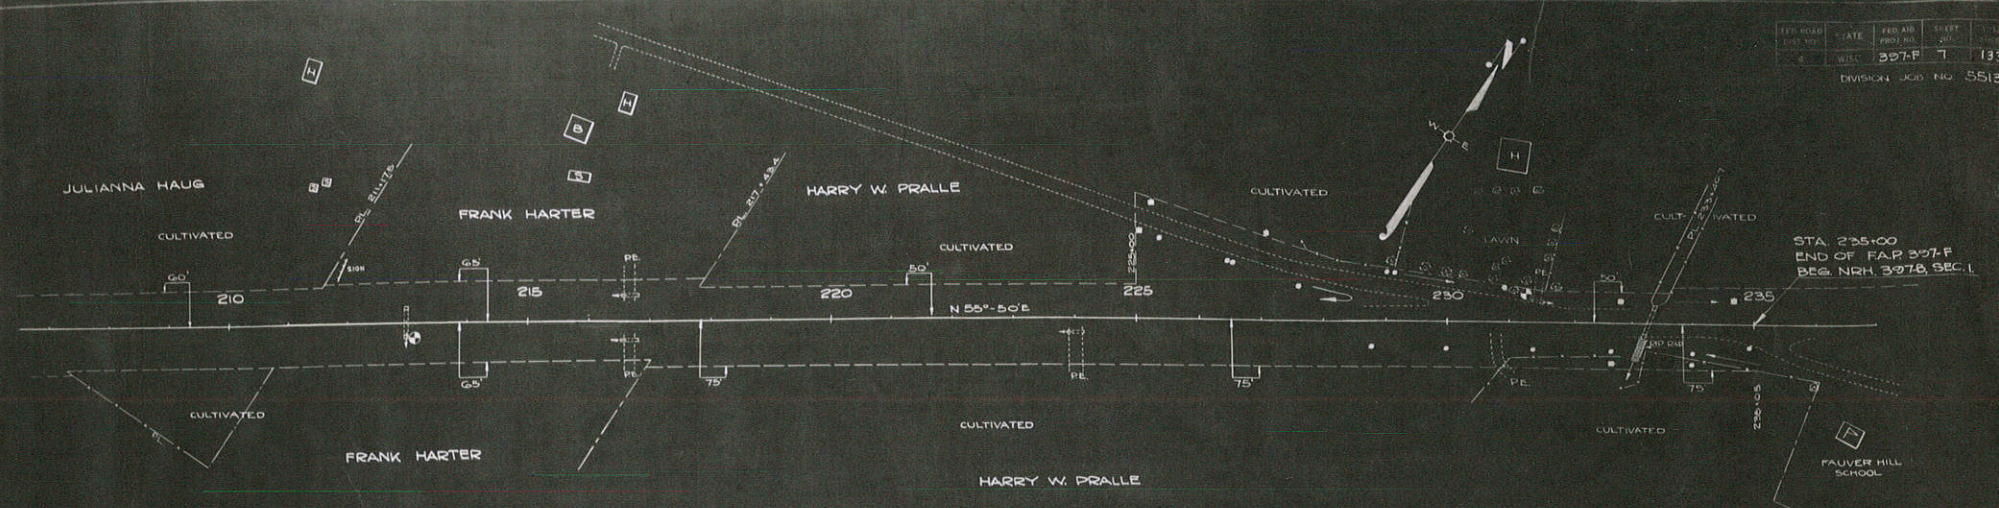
PLAN PROFILE OF R.C.C.P. BRIDGE
